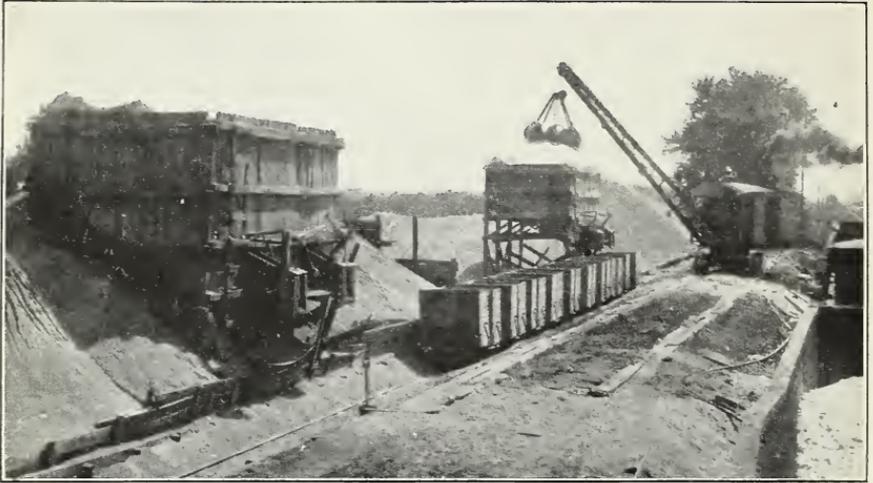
LOADING BATCH BOXES FROM OPEN BINS.
